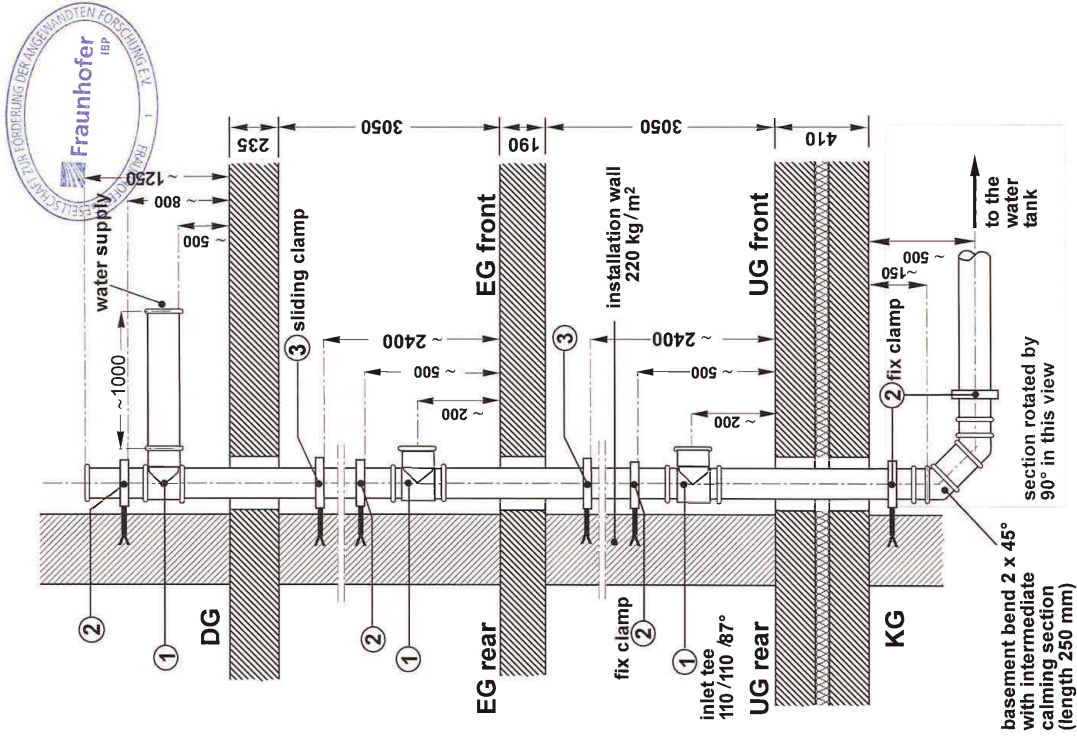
Installation plan of the pipe system "POLO-KAL 35" OD 110 (manufacturer: POLOPLAST), mounted with clamps "Bismat 2000" (mounting details of the clamps: see test set-up, drawing not to scale, dimensions in mm).
